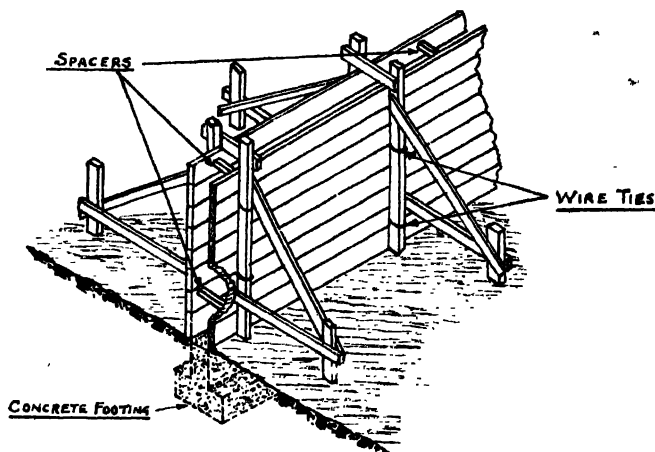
TYPICAL TIMBER SHUTTERING FOR WALLS
